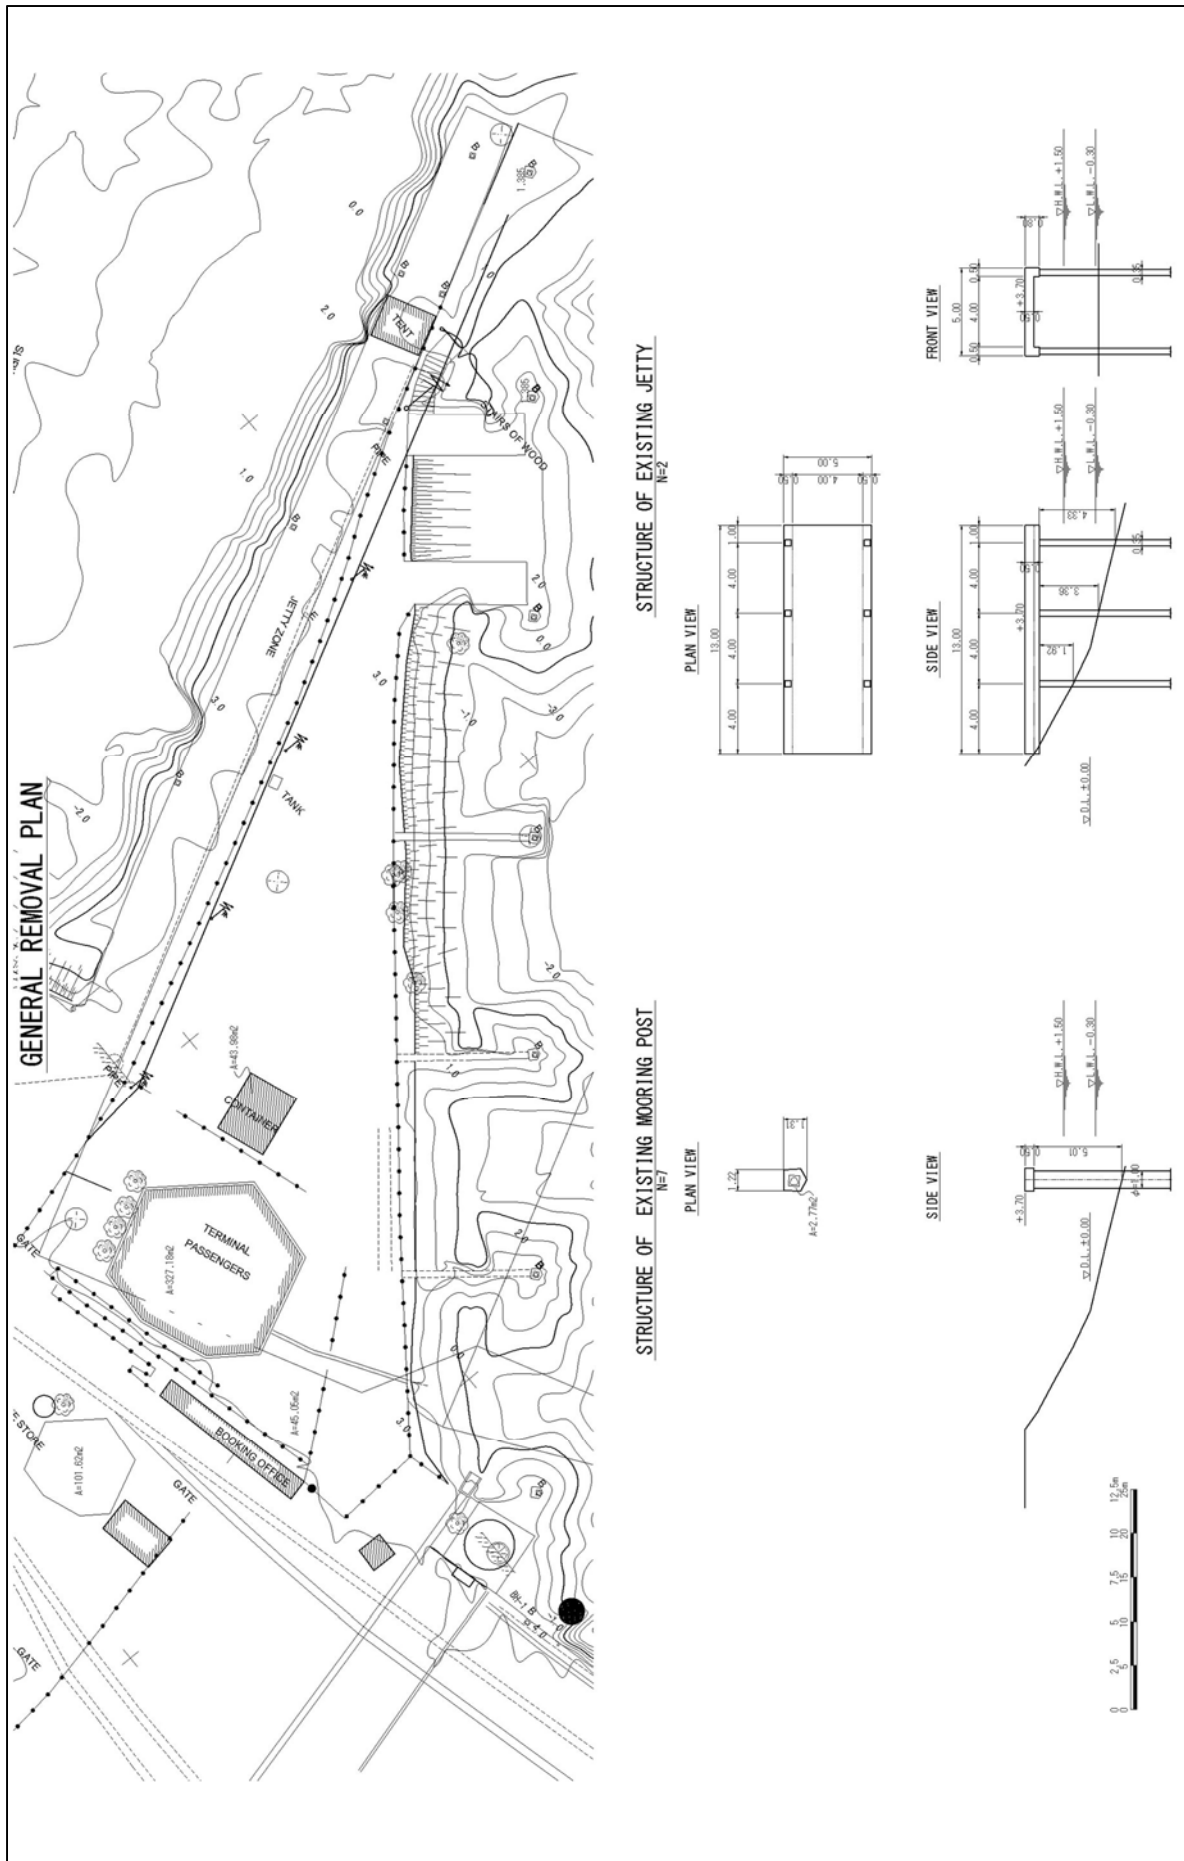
General Removal Plan of Existent Facilities
